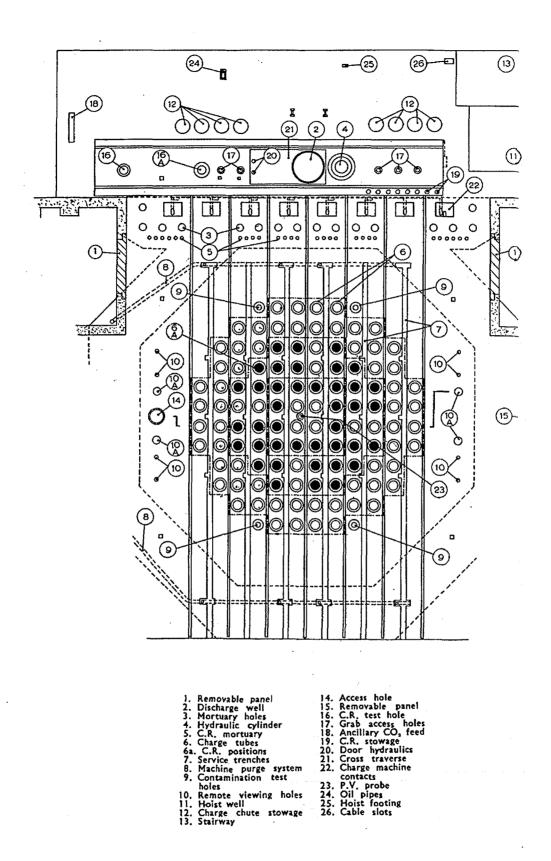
Plan of the charge floor. Charge tubes on a 813 mm pitch serve 16 channels. Control rod heads, shown shaded, comprise 40 in all.
